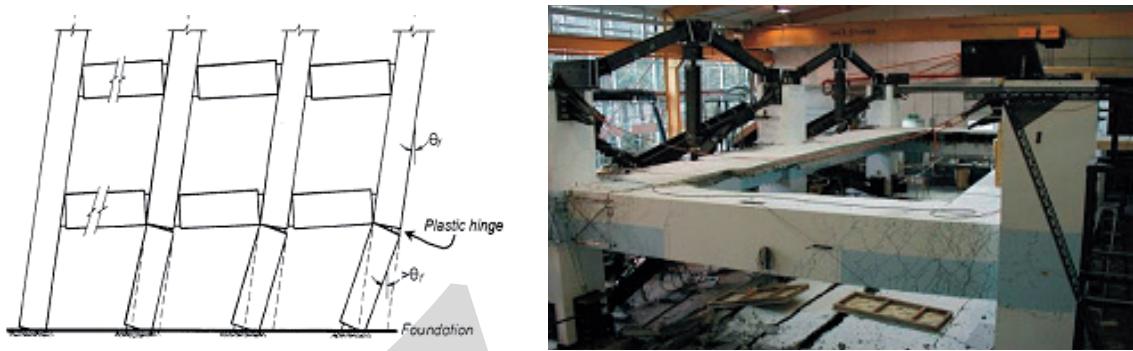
Left: horizontal displacement incapability between floor and frame systems due to beam elongation (fib Bulletin 27, 2003)
